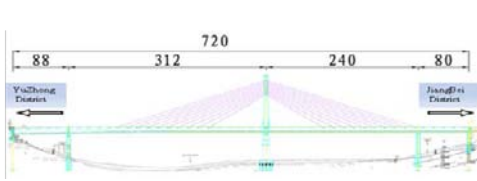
Elevation layout of the Qiansimen Jialing River Bridge
